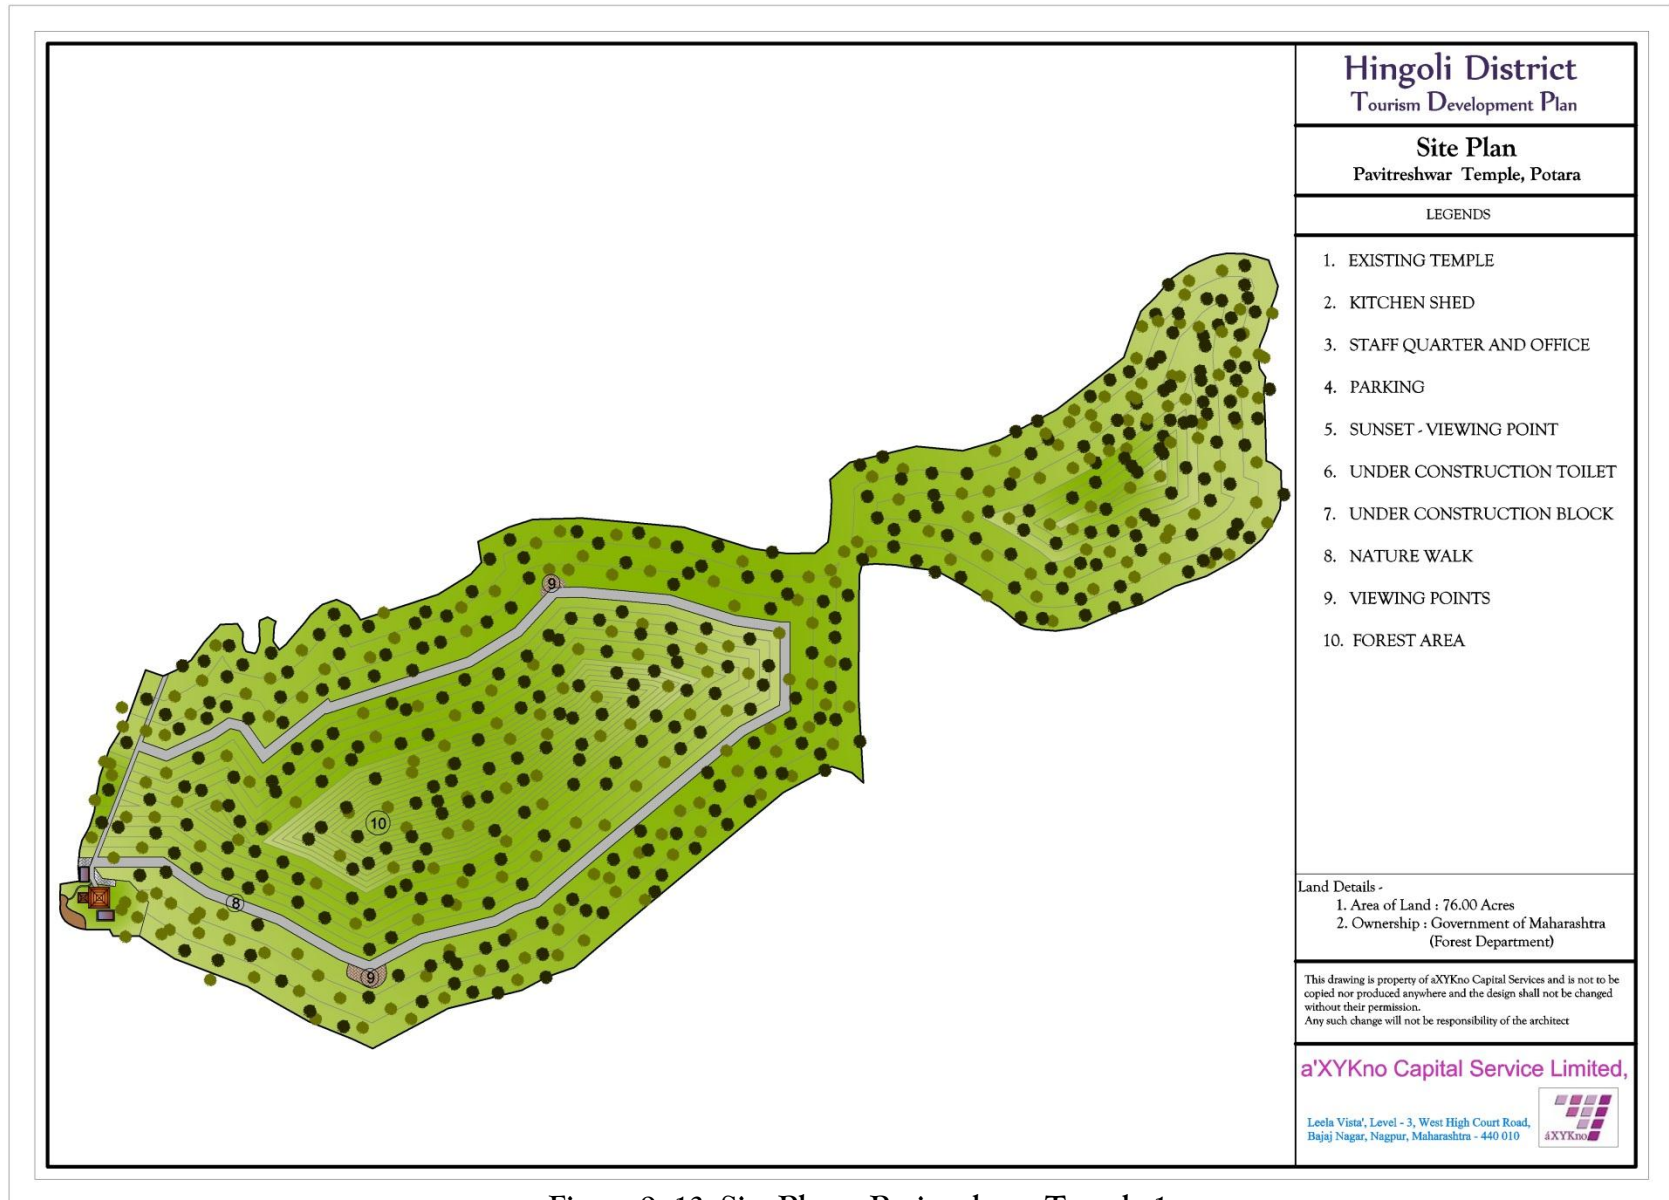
13: Site Plan – Pavitreshwar Temple 1
